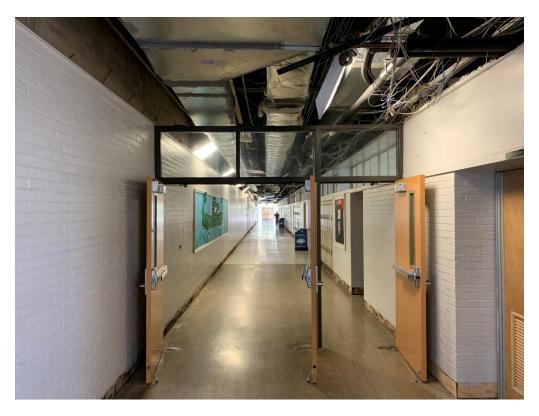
Corridor E-215 New Ducting will Still be an issue for the Second half of this Hallway
